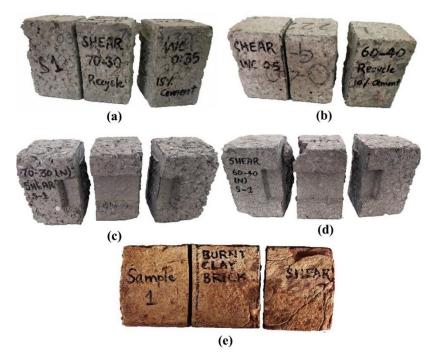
Failure mode of bricks in shear (a) RAC-70C30F brick (b) RAC-60C40F brick (c) NAC-70C30F brick (d) NAC-60C40F brick (e) Burnt clay brick
